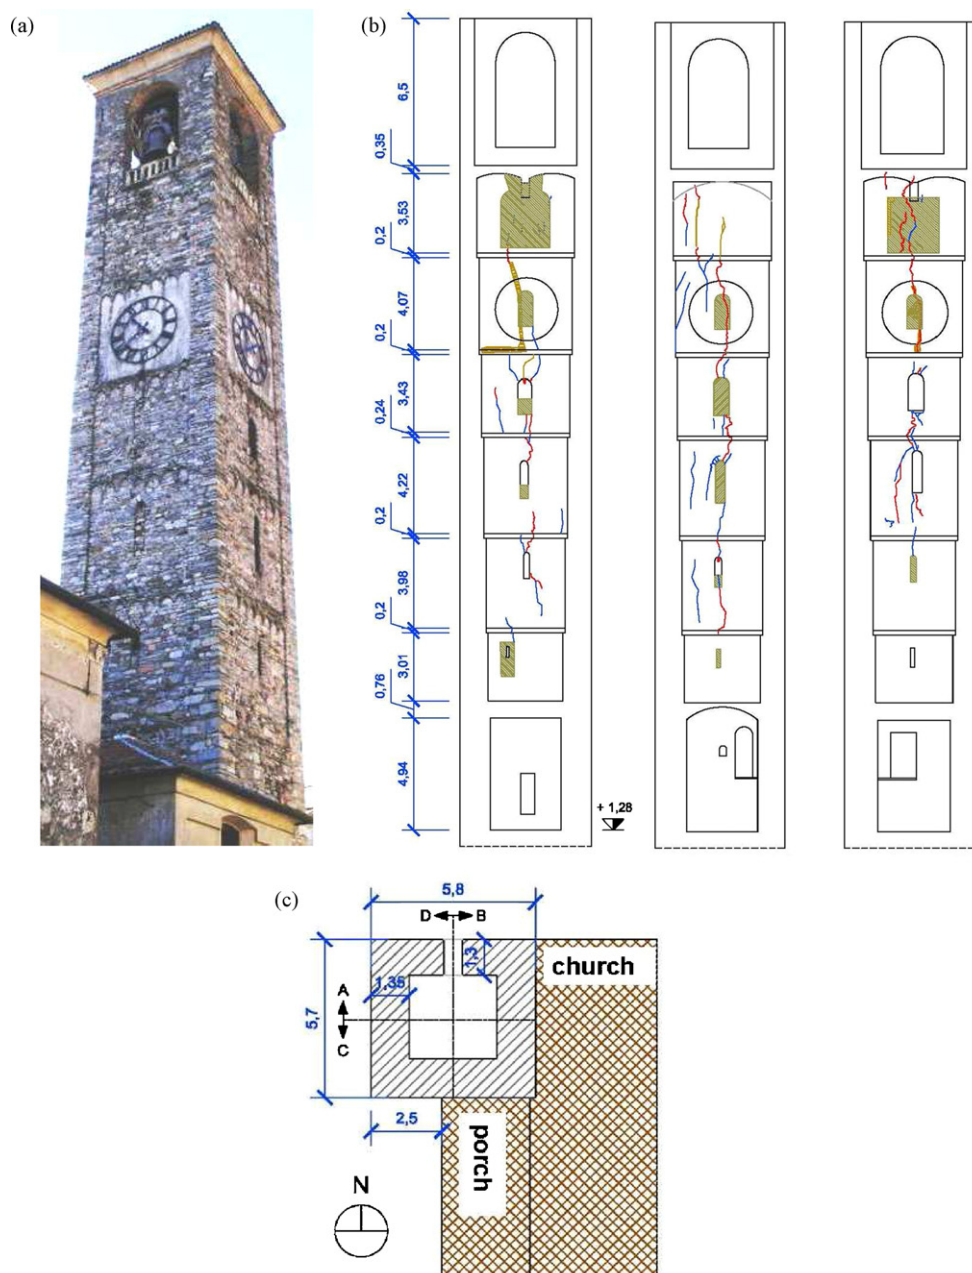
(a) Bell tower of Arcisate, Crack pattern on the tower sections (b) and plane (c).
